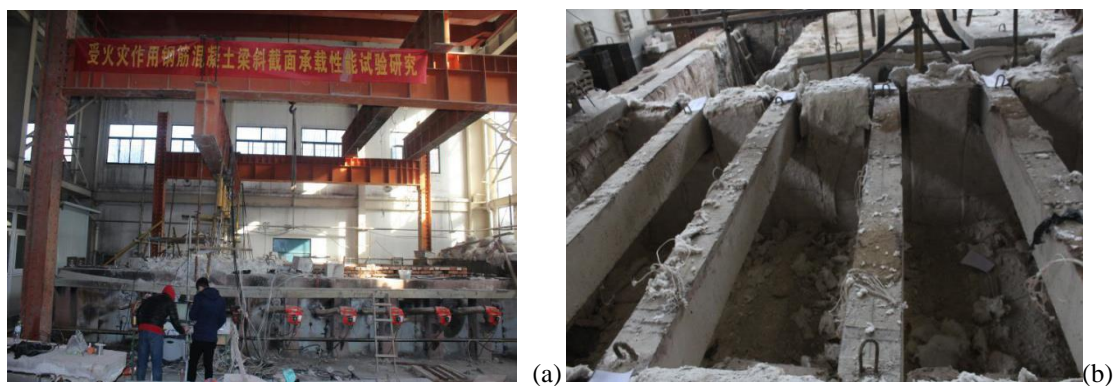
Layout of the fire test: a) The furnace chamber; b) Specimens arrangement in fire furnace.
